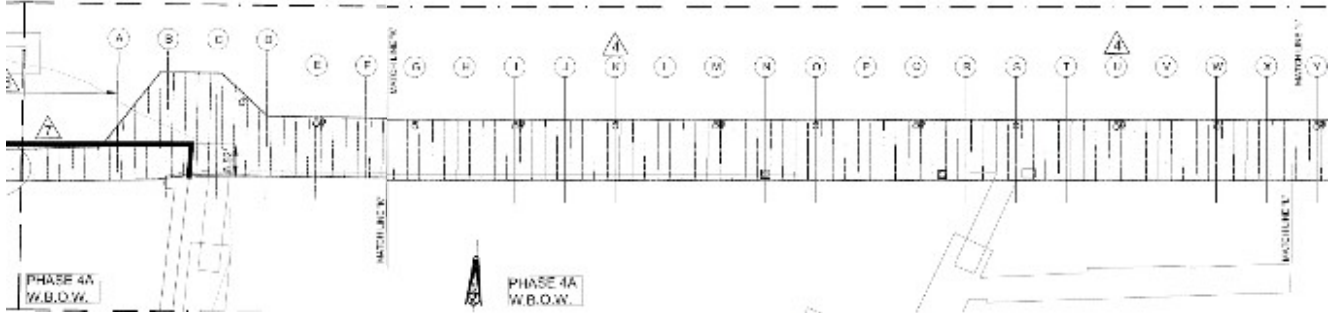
Start of Phase 4A at corner of timber and concrete retaining wall
